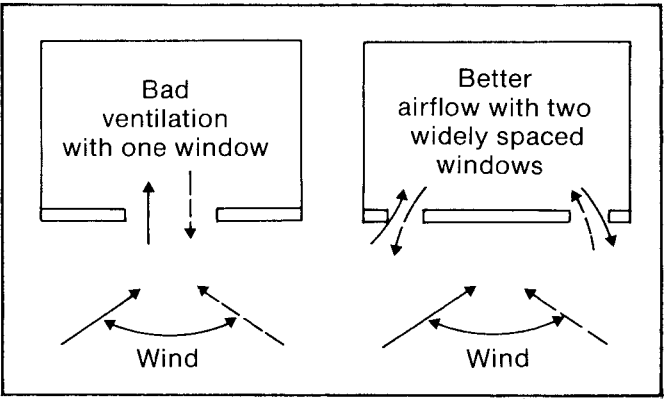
Two Windows Ventilate Better Than One in Rooms With One Outside Wall
